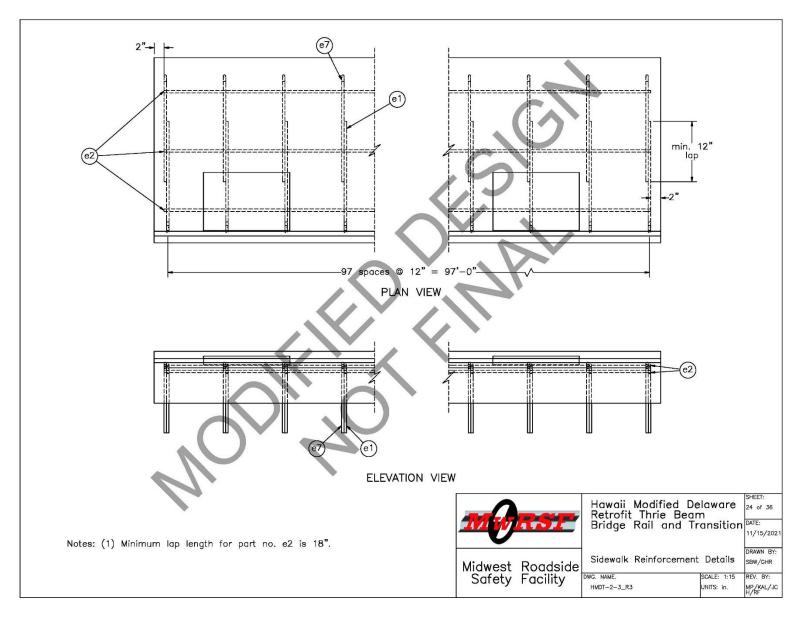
Sidewalk Reinforcement Details, Test Nos. HMDT-2 and HMDT-3
